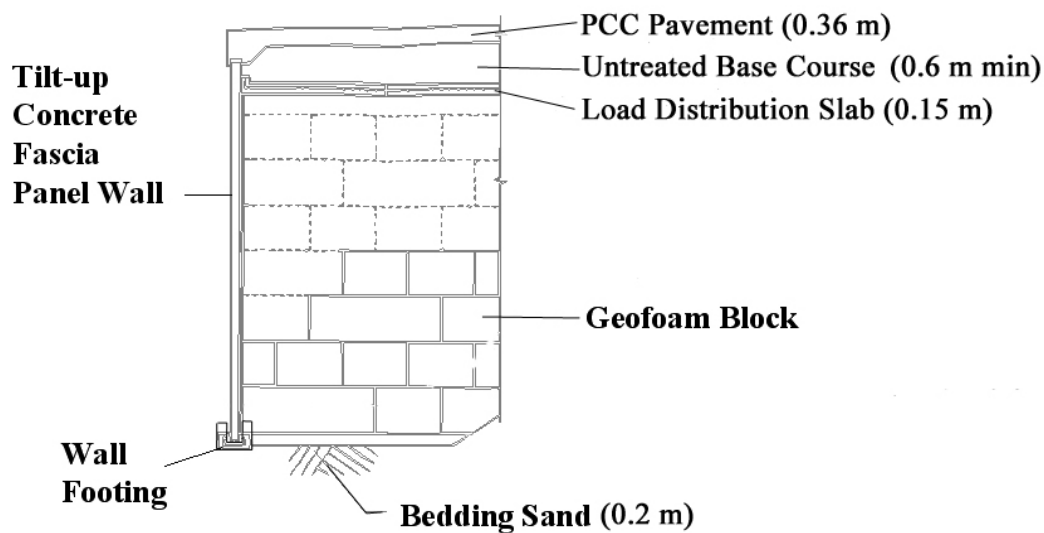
Typical Geofoam Cross-Section Used for the I-15 Reconstruction Project.
